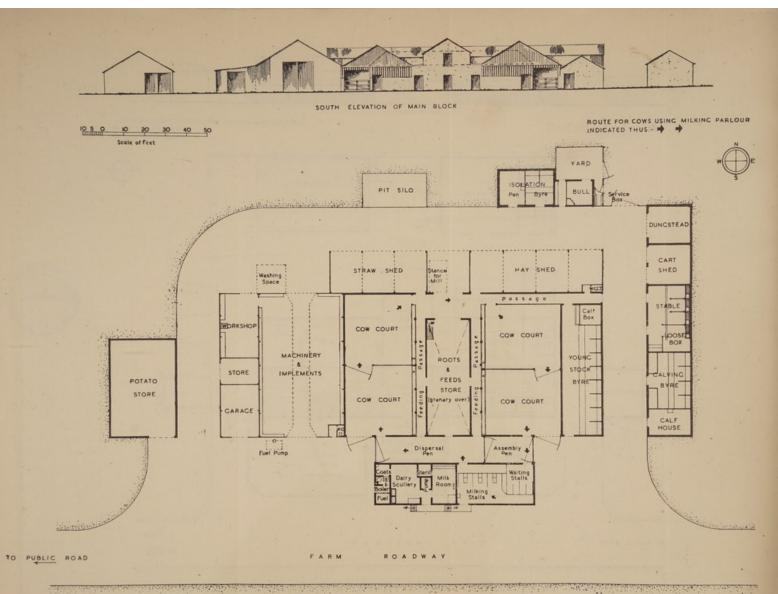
Plan E. Steading for Mixed Arable and Dairy Farm (Cow Court System) for 200 to 250 Acres (See paragraph 55)
